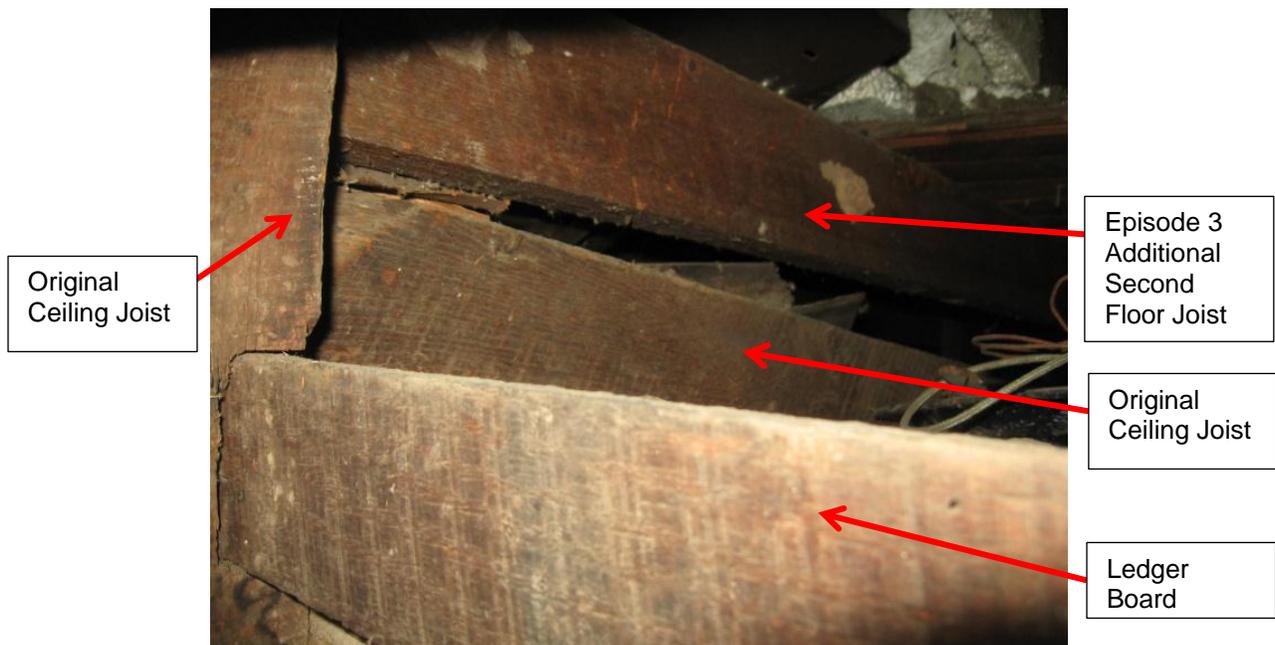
First floor ceiling cavity, perimeter joists, east end. (SEA 2011)
